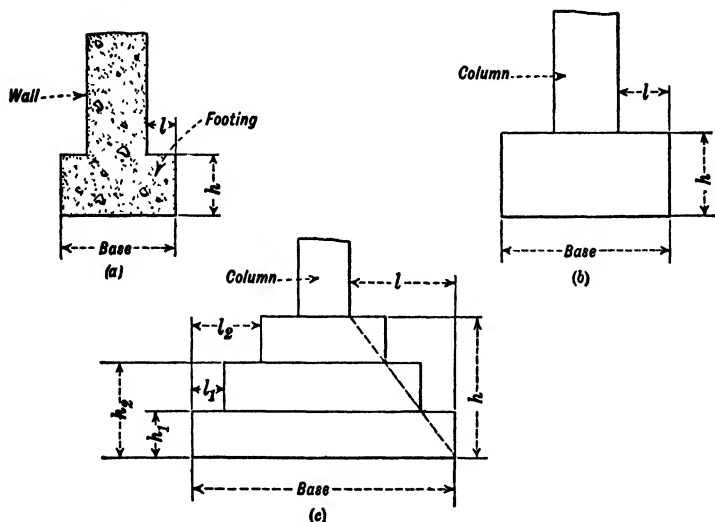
Plain Concrete Footing. (See p. 480.)
